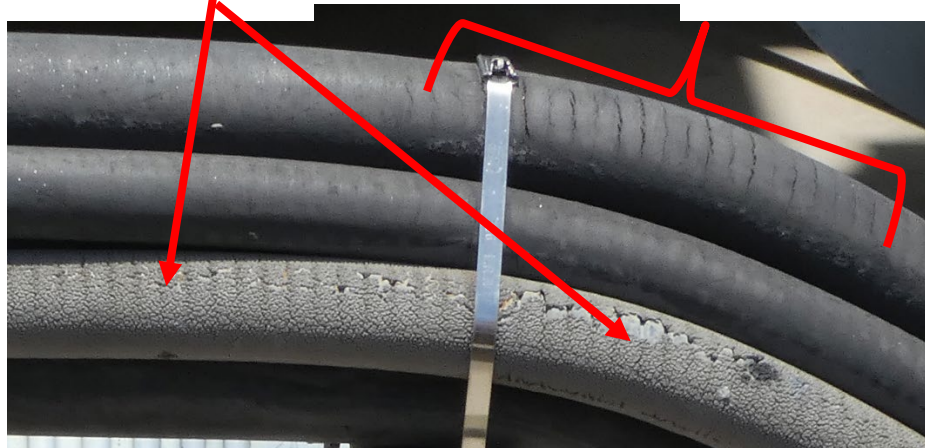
The original black PVC/PVC external multicore cabling showing the UV damage.
